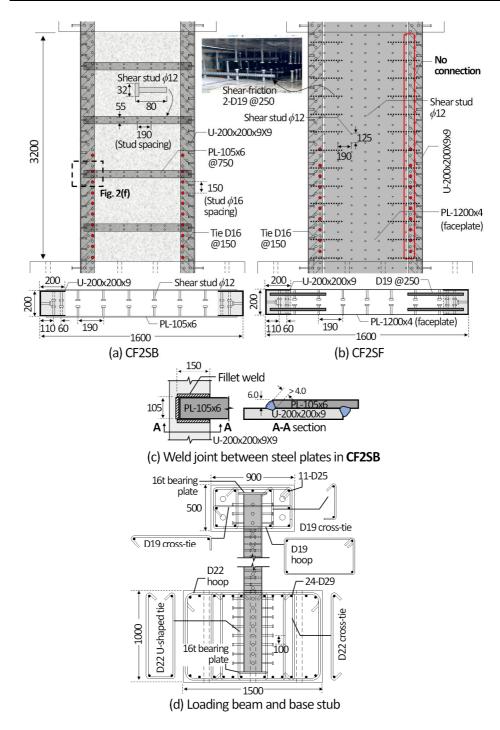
Details of flexural yielding specimens: (a) CF2SB; (b) CF2SF; (c) weld joint between steel plates in CF2SB; and (d) loading beam and base stub.
